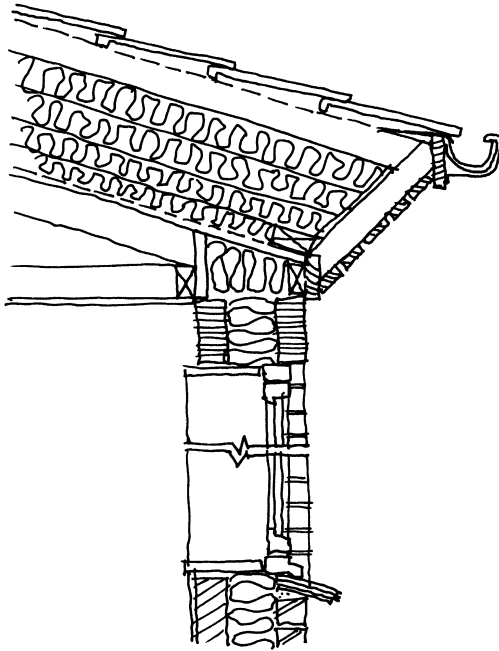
Superinsulation: Robert and Brenda Vale, Woodhouse Medical Centre, Sheffield.
